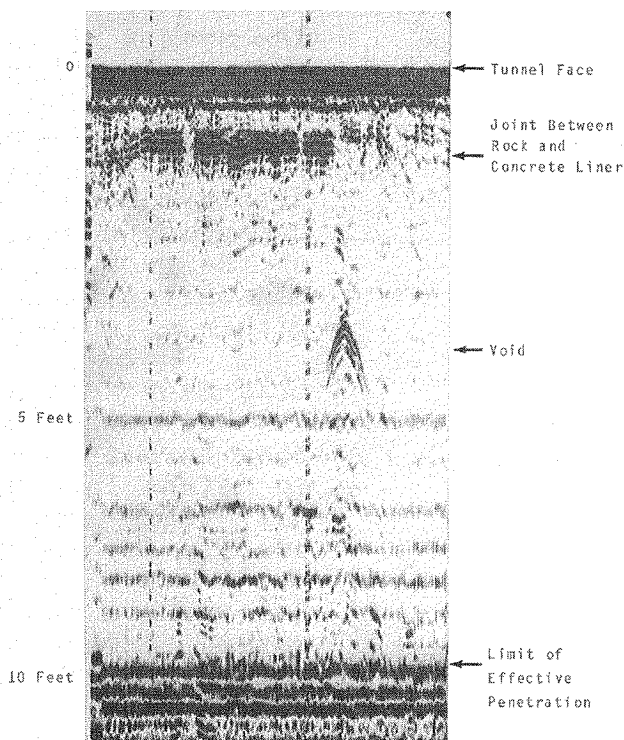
Ground-penetrating radar can be used to inspect critical cement structures such as dam facings, railroad and auto tunnel walls, and aquaducts. In this example, GPR was used to examine the concrete walls of a railroad tunnel in France. The boat-wake pattern is a void within the solid rock behind the tunnel facing (at the top of this figure). This void is about 5 feet back into the rock.
